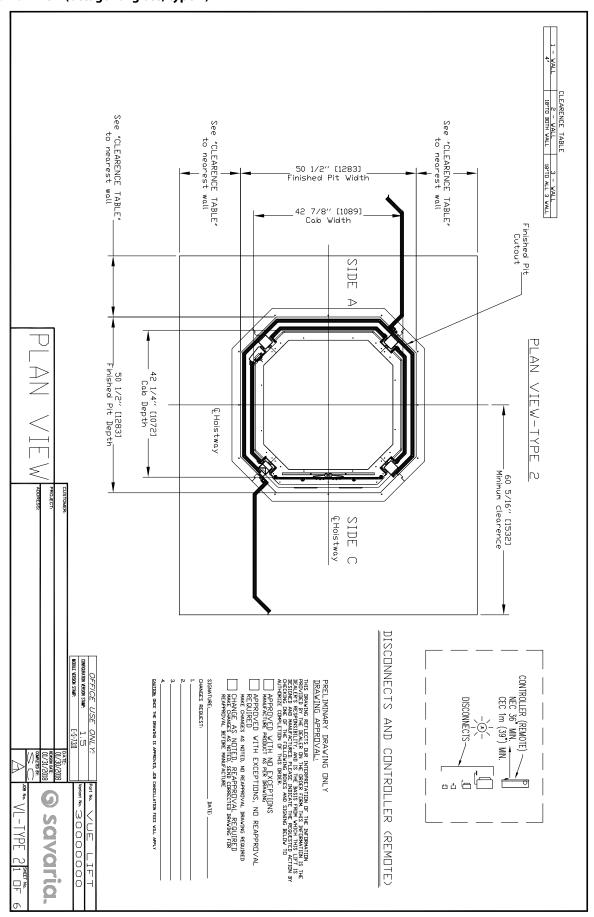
Pit/bottom floor/thru-floor view (octagonal glass, type 2)
